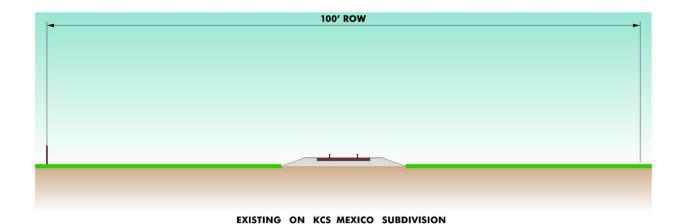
Regional Rail Typical Section KCS Railroad - Existing Conditions
